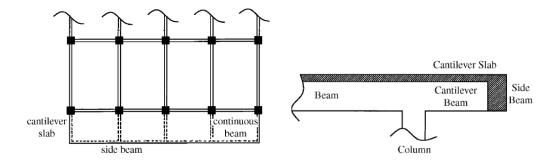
Cantilever Slab (Özmen and Ünay, 2007)
